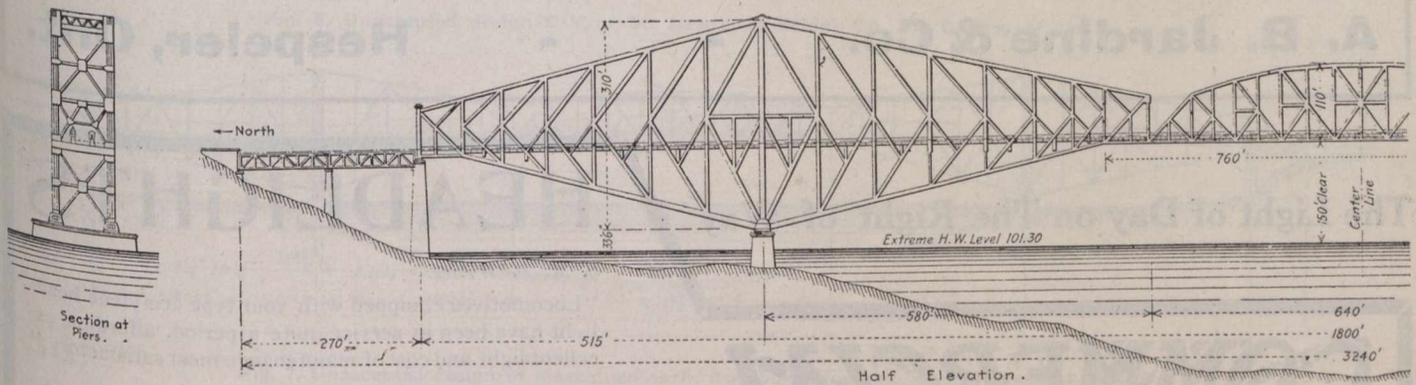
Accepted design of St. Lawrence Bridge Co., for new bridge.
